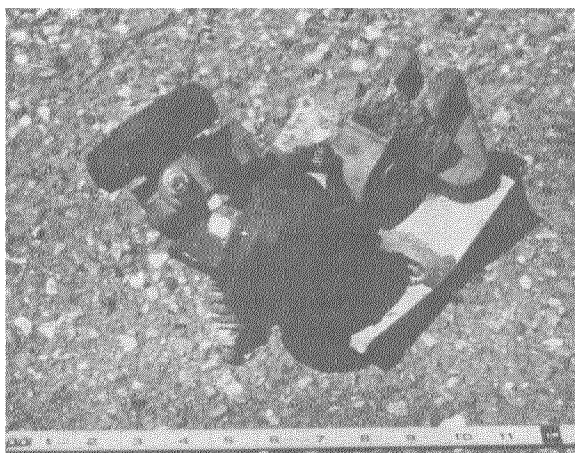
Broken roller guide/shoe from electric traction elevator in five-story Engineering Building, UCSB.
